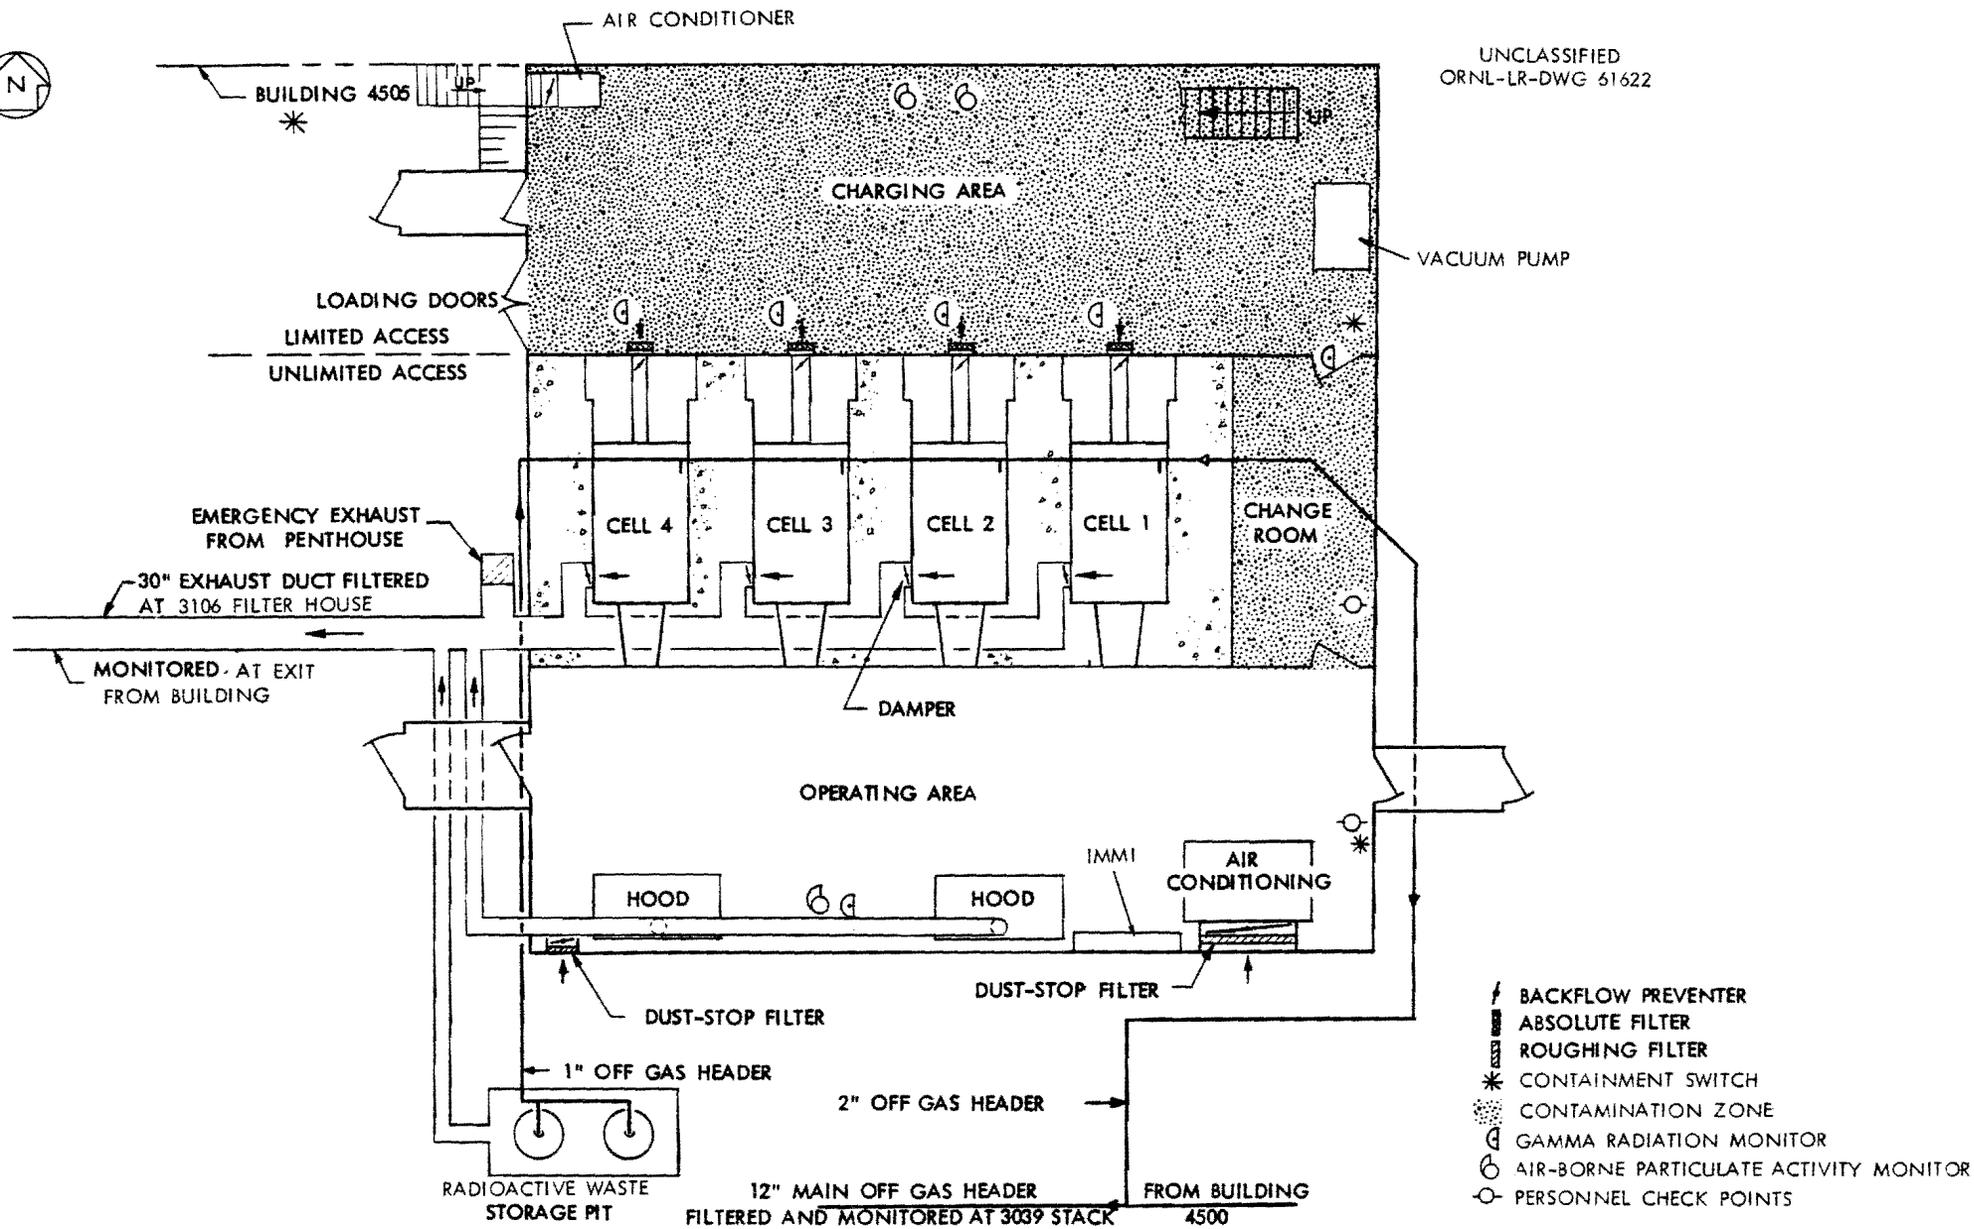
BUILDING 4507 FIRST FLOOR PLAN VENTILATION SCHEMATIC
